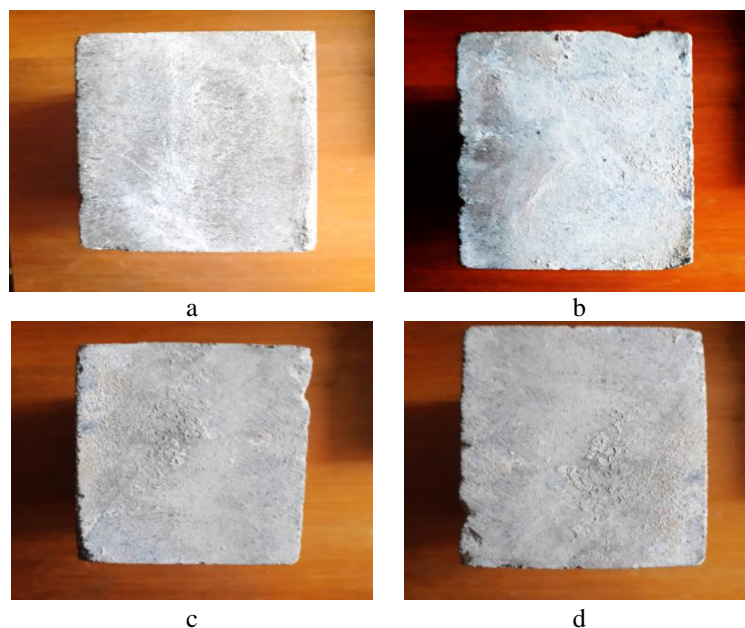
Images of geopolymer concrete specimens reinforced with animal fibers;
